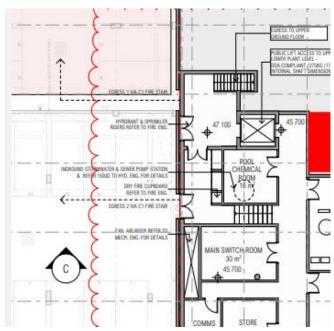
Stage 2 Plans – C2 Basement Floor Plan, Rev 10
